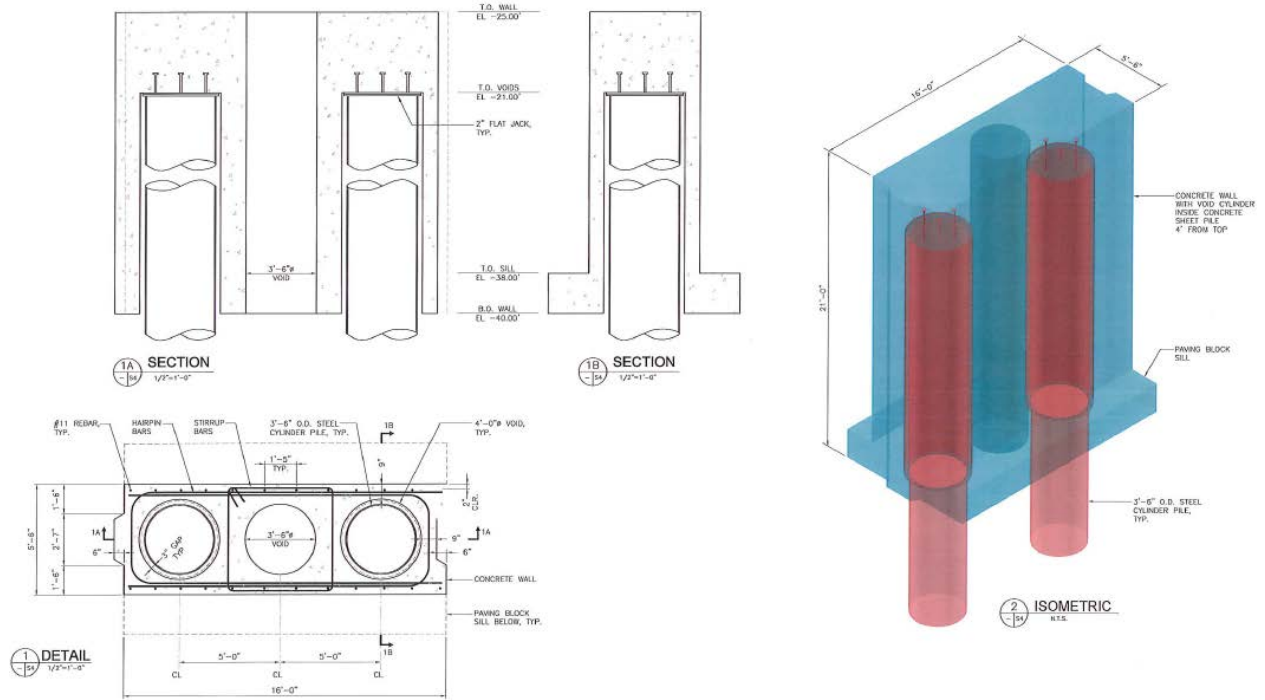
Alt. A - Detail of the Inlet/Approach Channel Intermediate Wall Design for In-TheWet Construction
